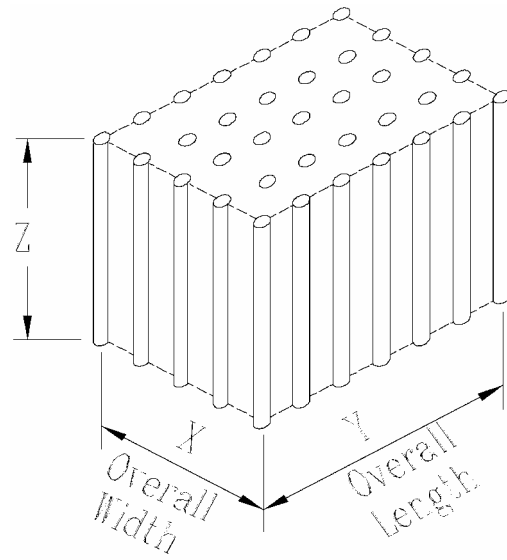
Pile Group Acting as a Block Foundation.
